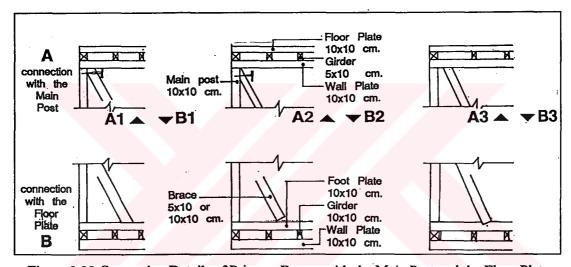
Connection Details of Primary Braces with the Main Post and the Floor Plate
